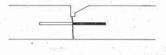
SECTION OF SHALLOW JOINT SPALLING
